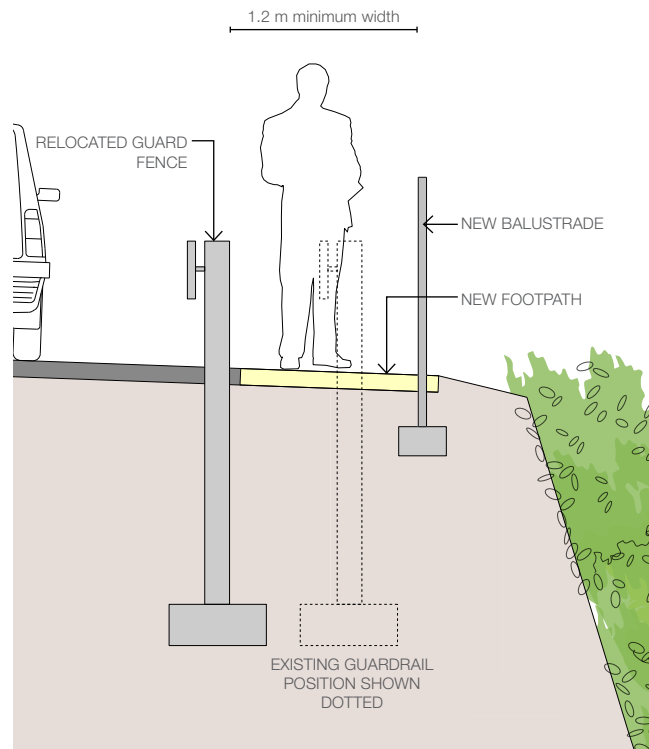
Indicative section showing relocated guard fence, new footpath and new balustrade along Boiler House Road
